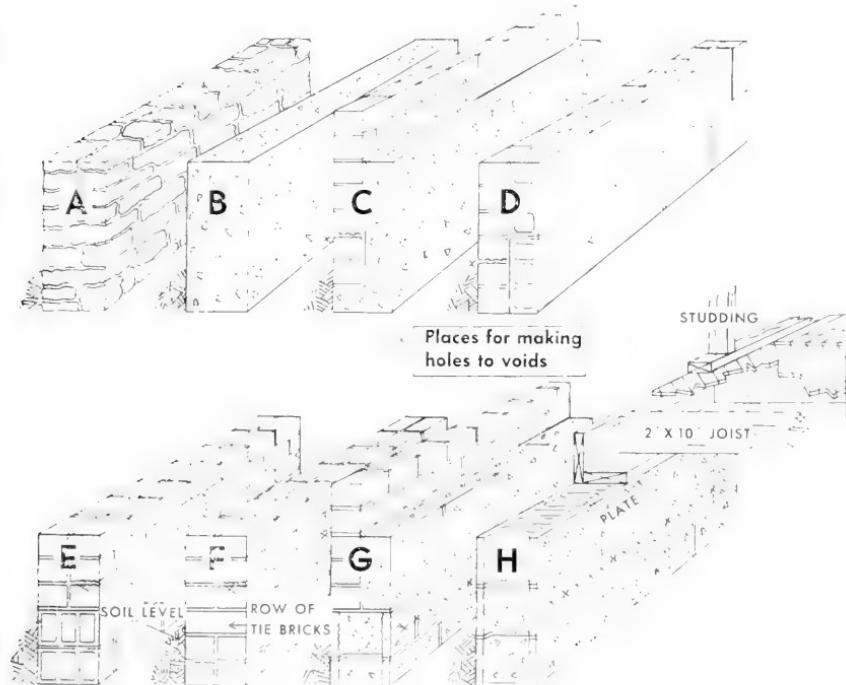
Eight types of foundation walls used in construction of buildings in Illinois: A, stone; B, poured concrete; C, poured concrete with brick veneer; D, brick and hollow tile; E, tile with solid brick; F, brick; G, concrete block with brick veneer; H, hollow concrete block. Shown here are the possible locations of voids and the places where chemical poison should be applied to control termites. The diagram of the frame superstructure in H makes apparent the ease with which termites may gain access to wood in this type of construction. A shield, usually metal or poured concrete, should be installed, when the building is constructed, to separate the foundation from the superstructure, fig. 18.
